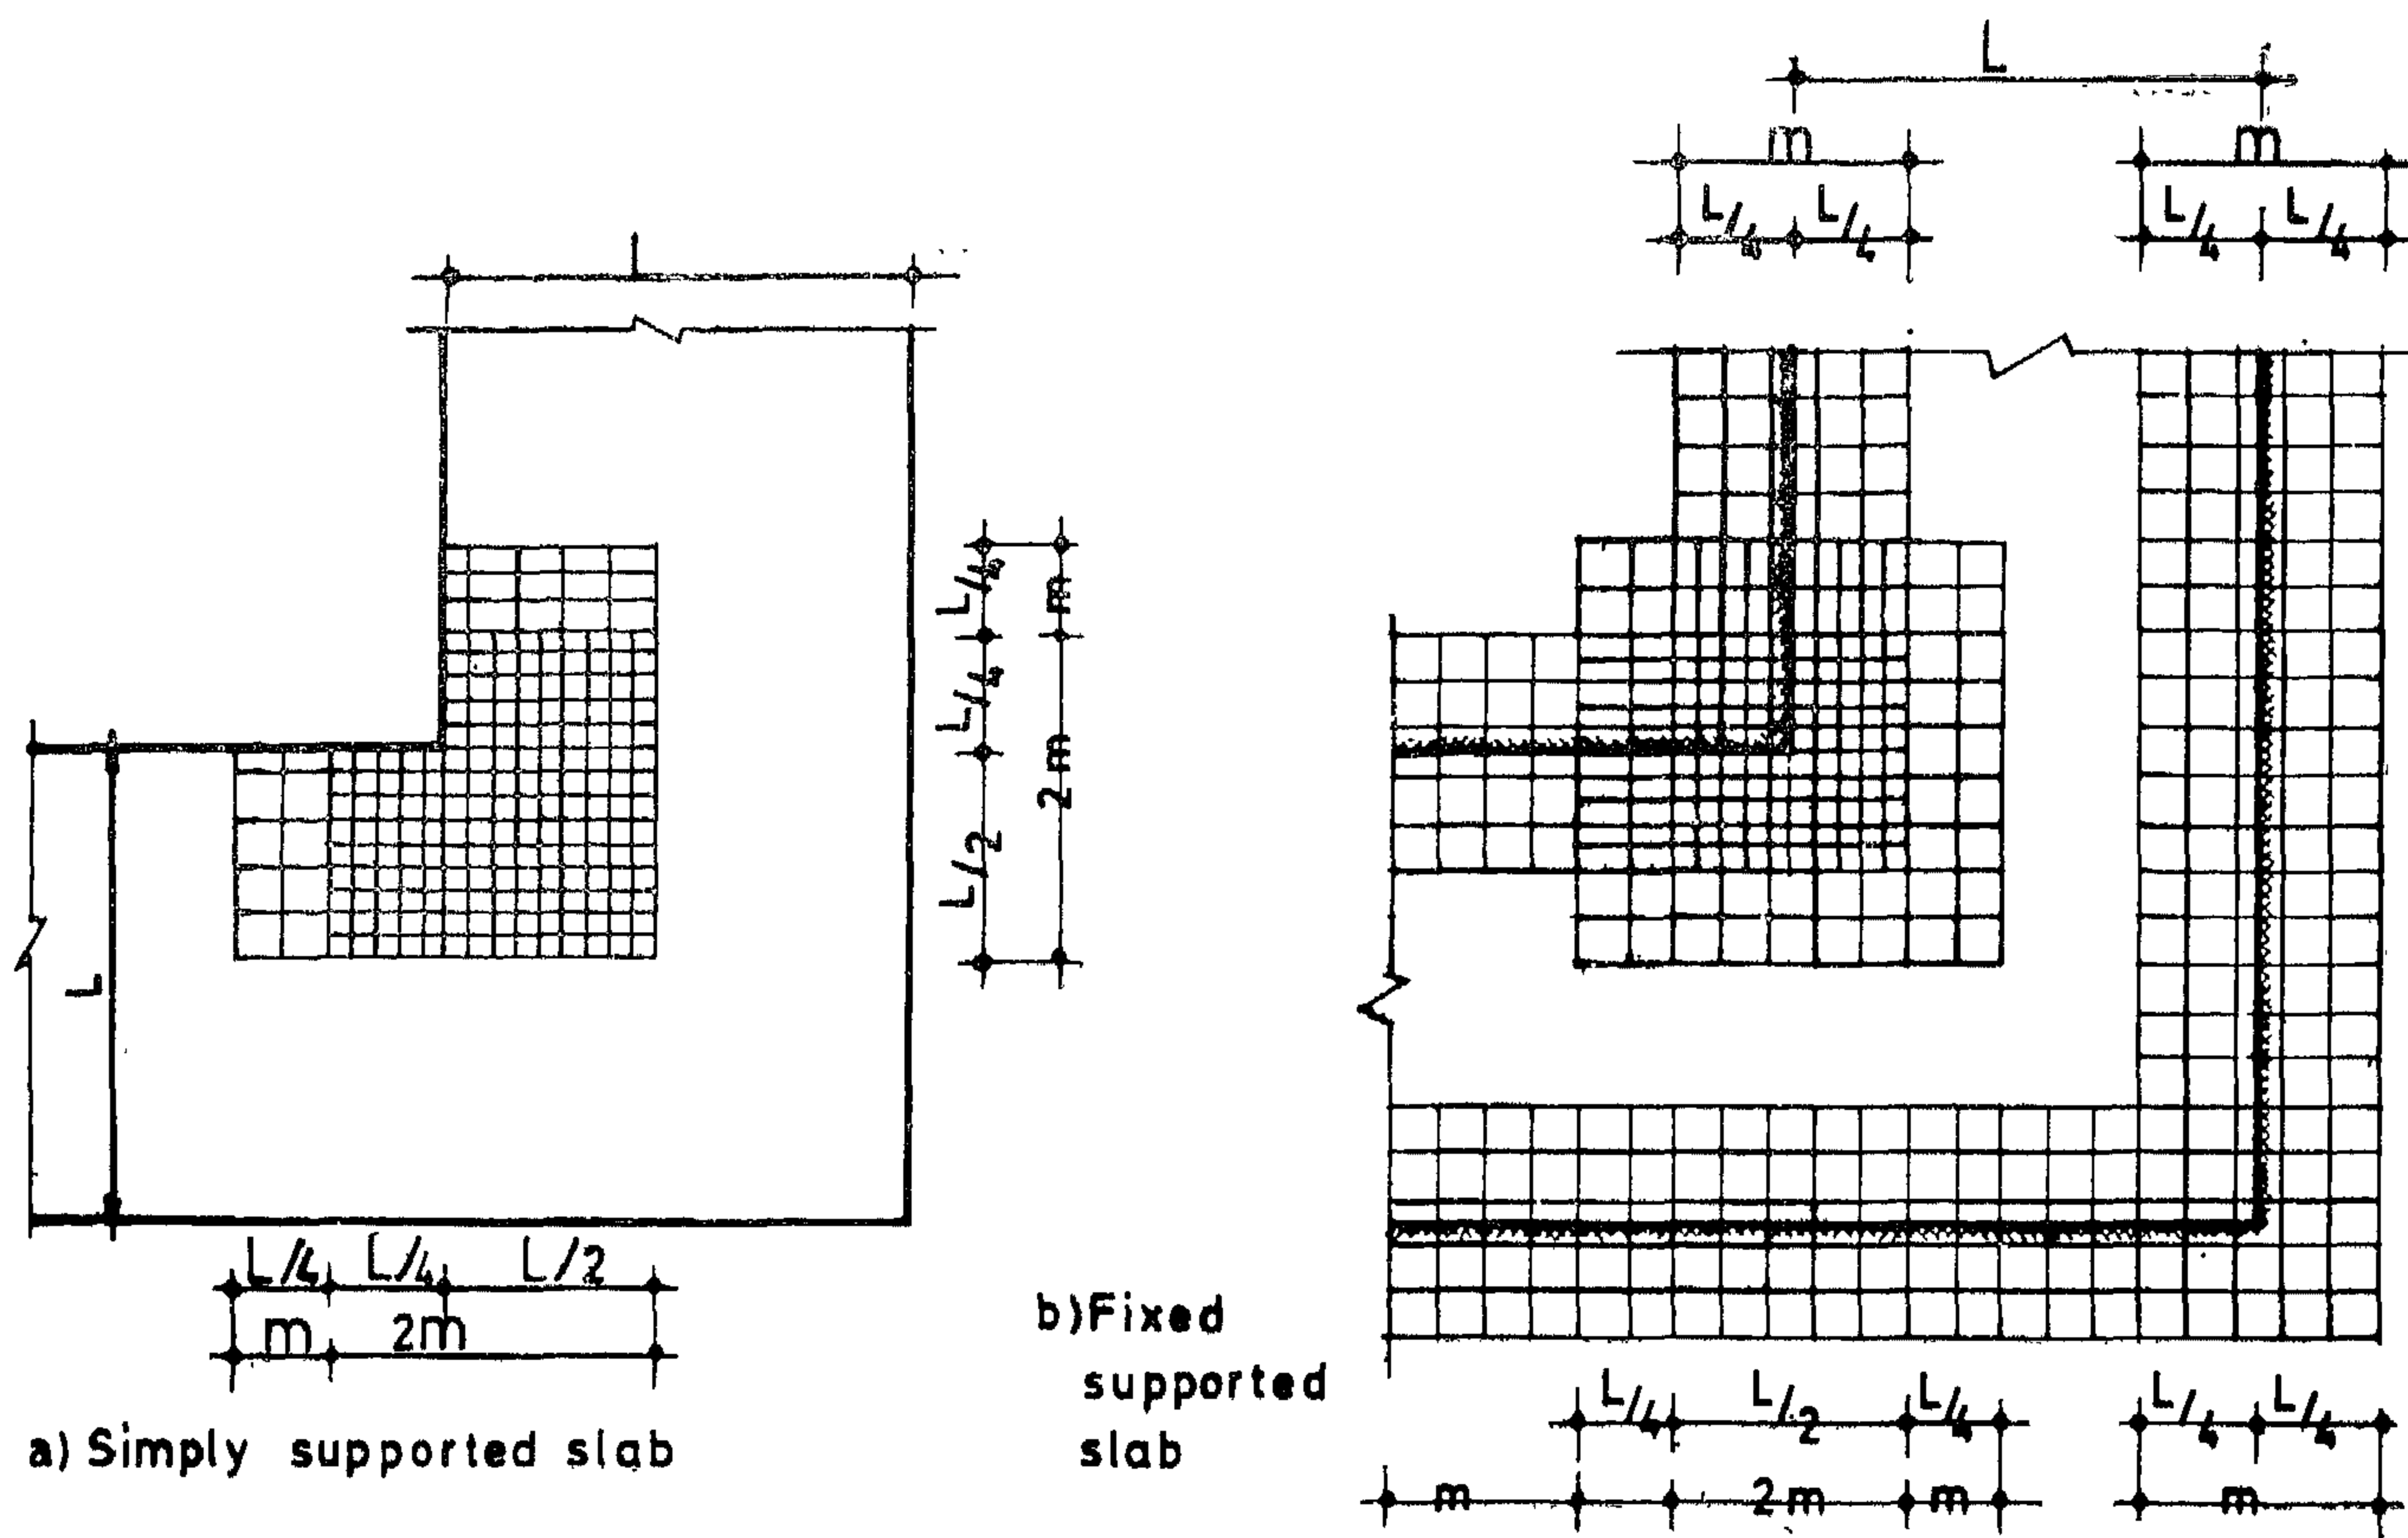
RECOMMENDED ARRANGEMENT OF TOP RFT OF L-SHAPE CORNER SLAB
